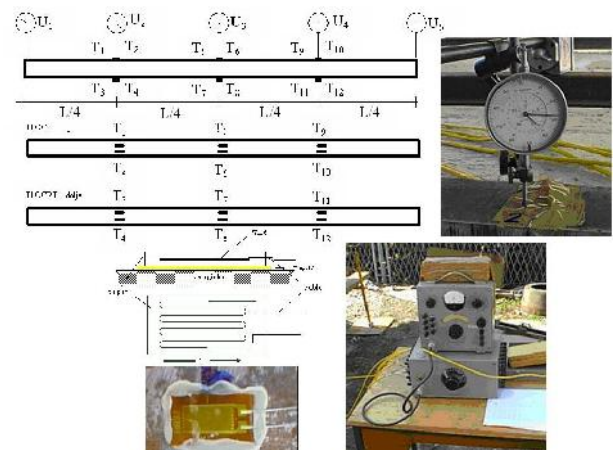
Monitoring girder settlement and distortions: a) diagram of setting up the micro-gauge and tensometer along the girder, b) micro-gauges on the girder, c) attached (glued) electrically resistant tensometer on the girder, d) The Wheatston bridge
